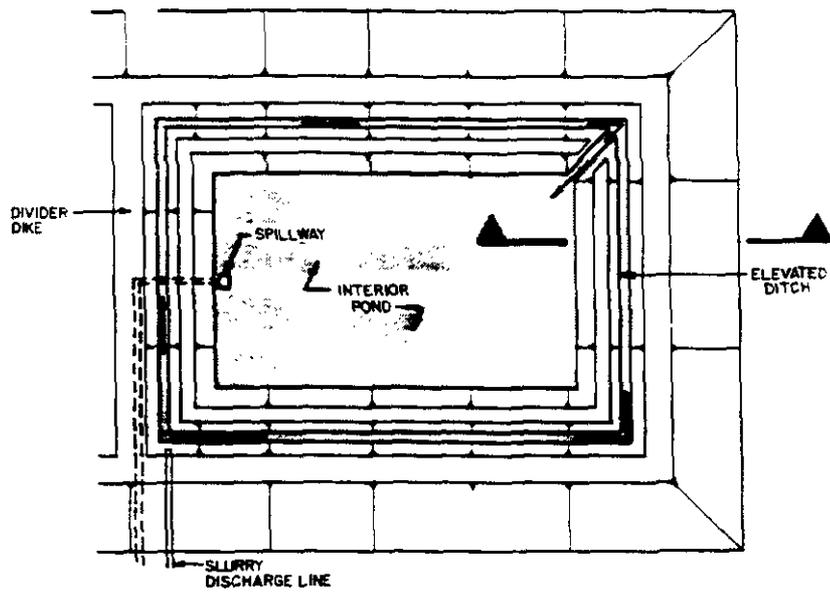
Schematic of Elevated Rim Ditch Used to Sediment Coarse Gypsum Around Stack Perimeter
